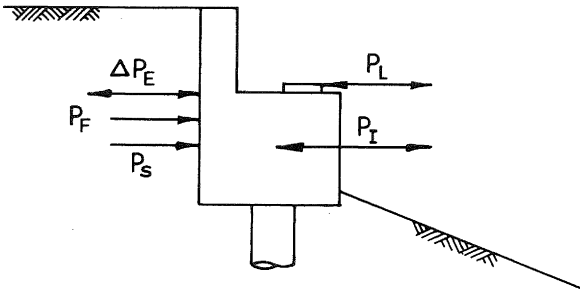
LOAD LIMITING CONNECTION TO BRIDGE SUPERSTRUCTURE
